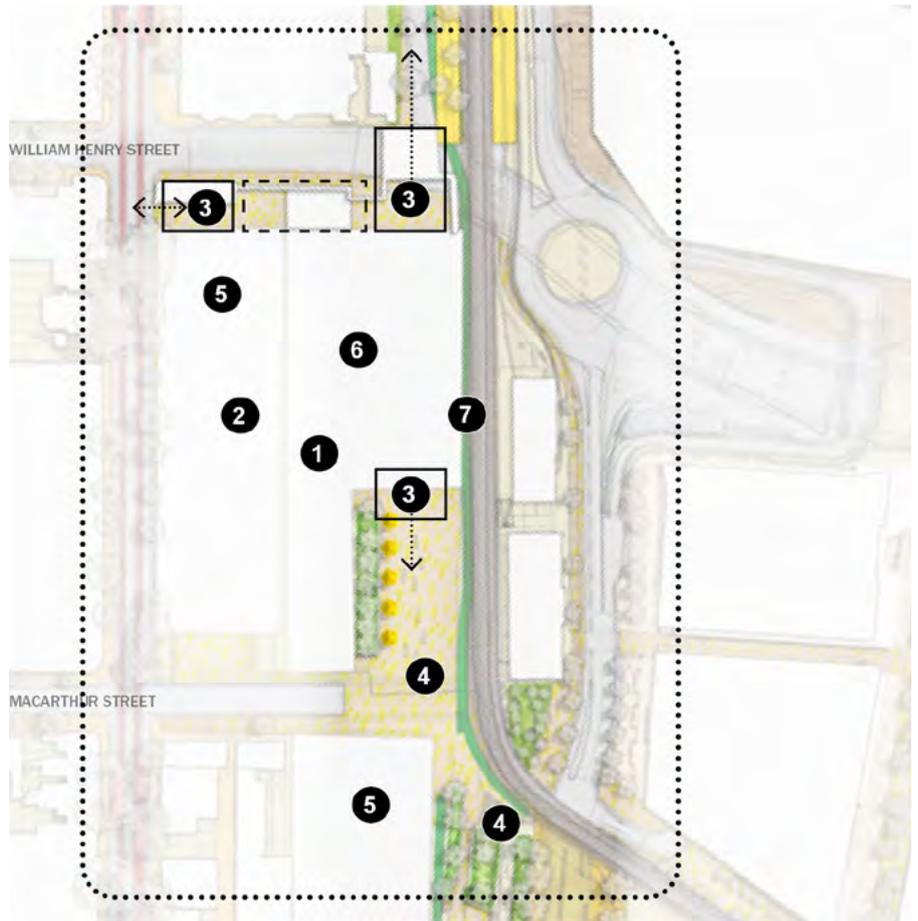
/ Plan of Powerhouse Character Area (Hassell)
